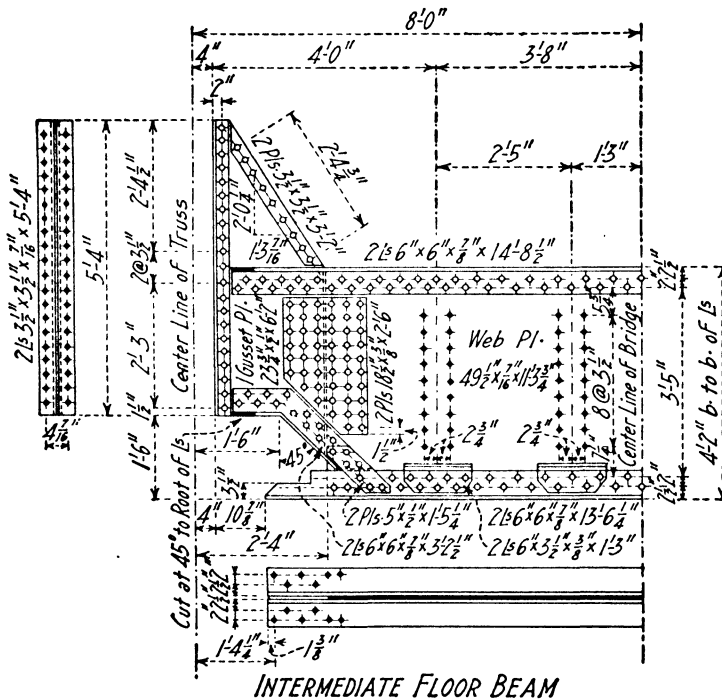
INTERMEDIATE FLOORBEAM CONNECTION. A. T. & S. F. RY.
